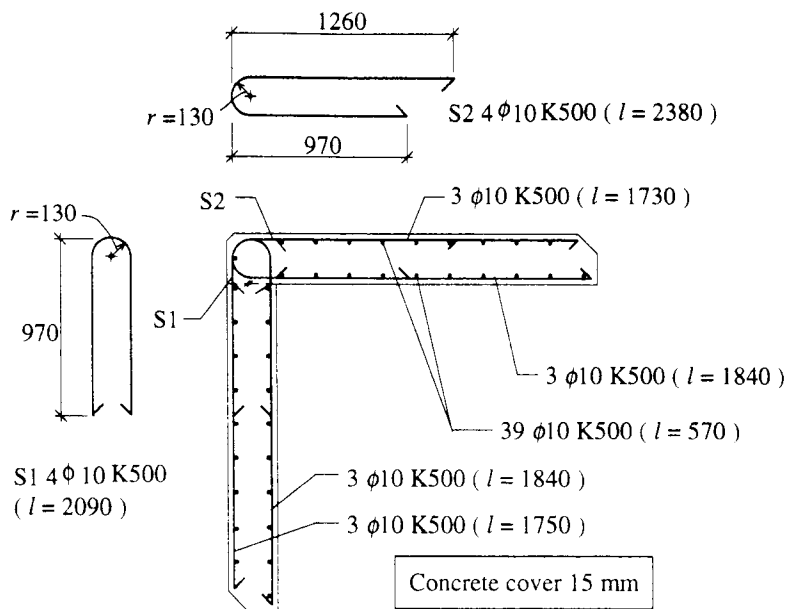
Reinforcement bars used in specimens RV7 and RV8.
